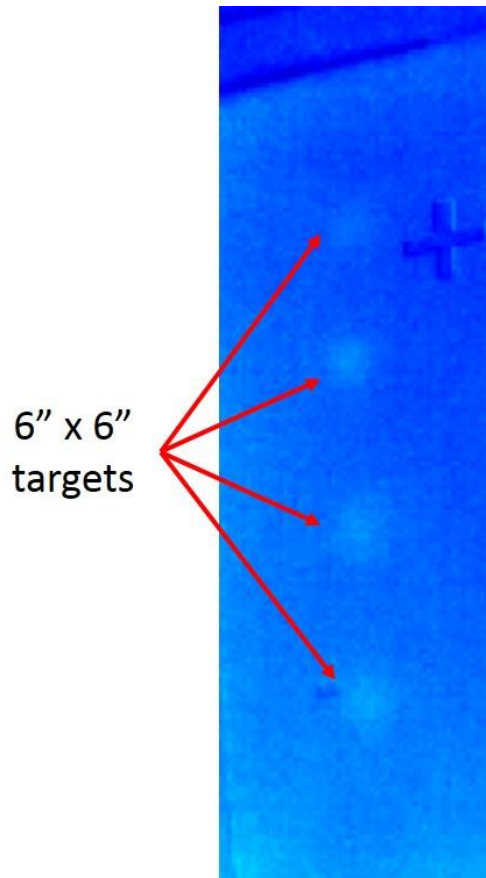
Concrete block constructed for testing nondestructive evaluation technologies
